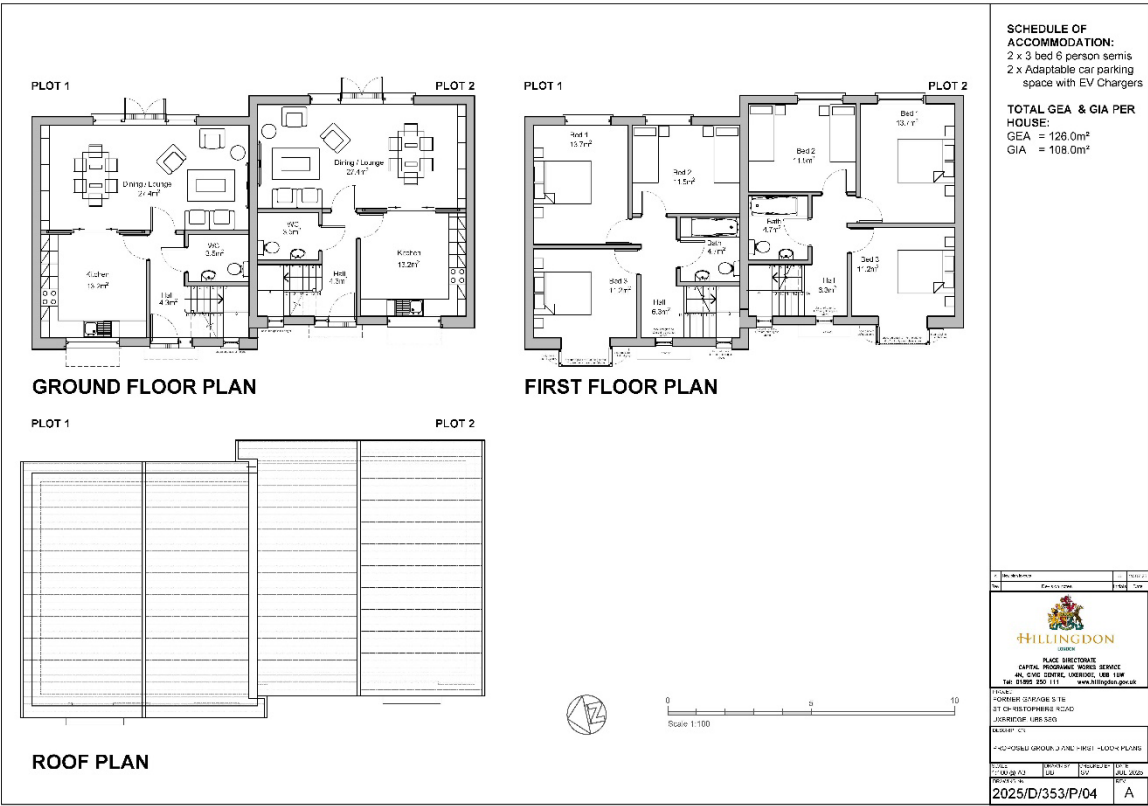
Proposed Floor Plans Ref:2025/D/353/P04 rev A.
